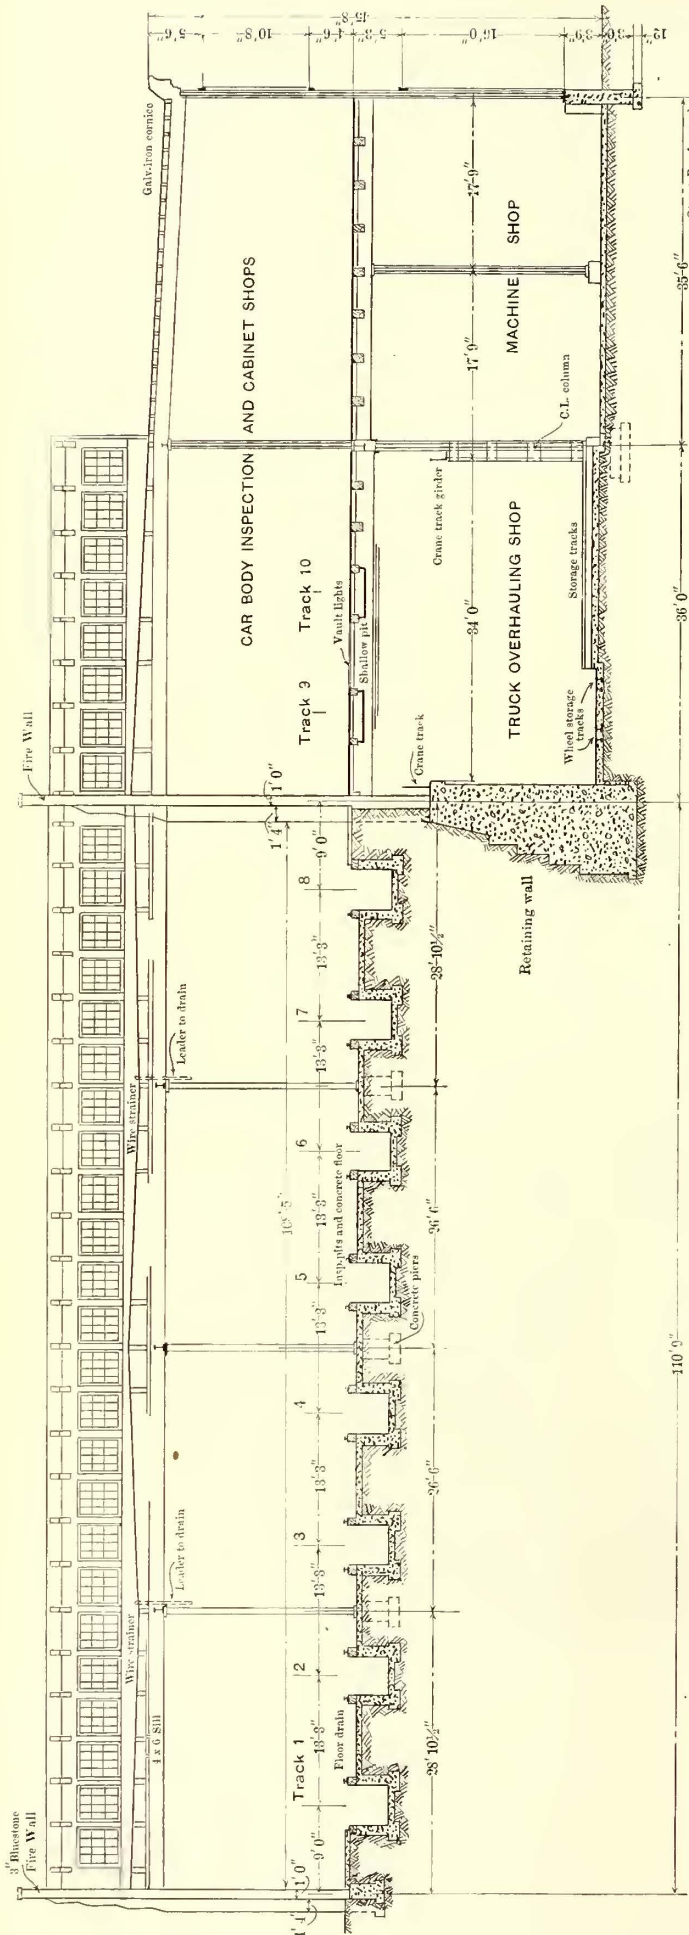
TRANSVERSE SECTION THROUGH THE INSPECTION AND MAIN SHOP BUILDINGS, SHOWING THE GENERAL CHARACTER OF CONSTRUCTION, FLOOR LEVELS, TRACK LAYOUTS, ETC. THE MEZANINE FLOOR OF THE SHOP BUILDING IS NOT SHOWN ON THIS SECTION
